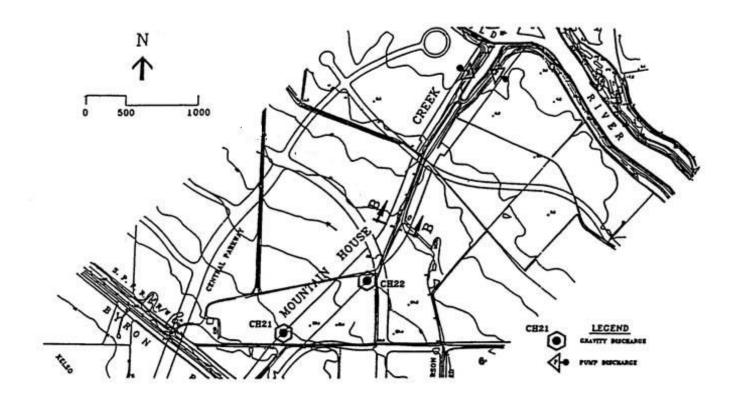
MOUNTAIN HOUSE CREEK - SECTION B-B
